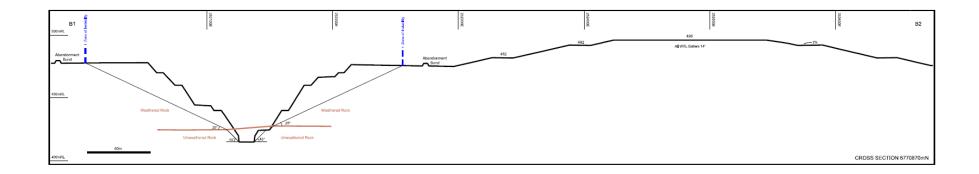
Cross-sections of VB North Open Pit Showing Zol and Abandonment Bund
